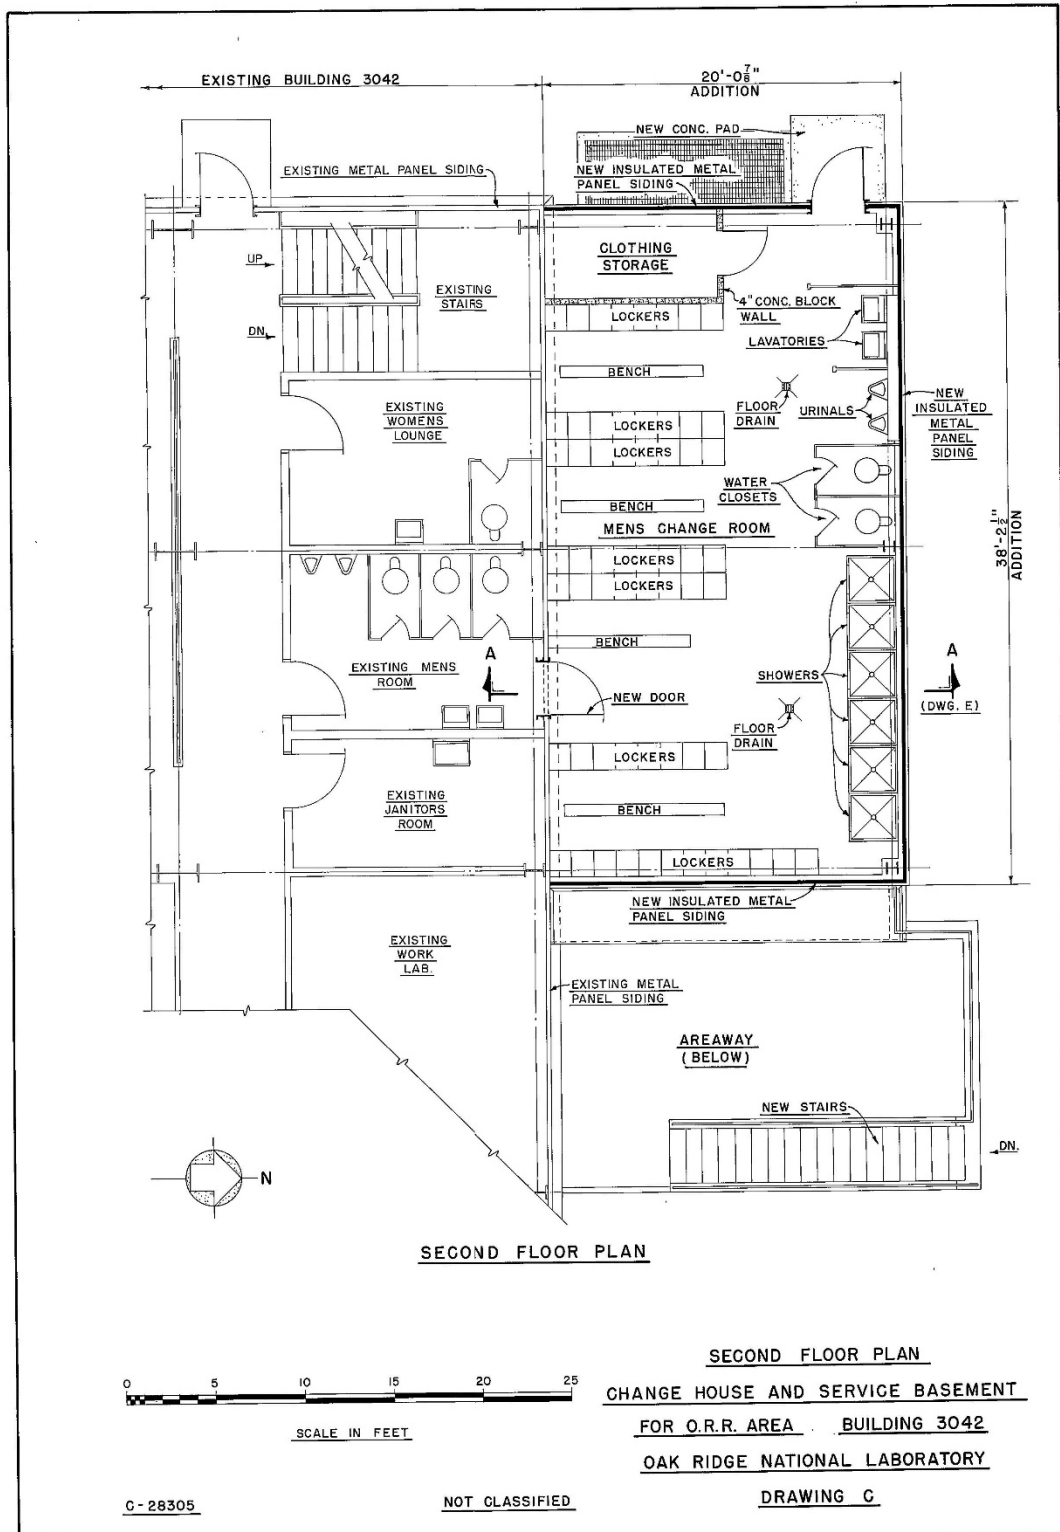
Second floor plan for the circa 1957 Change House and Service Basement addition to the north elevation of Building 3042 (Oak Ridge National Laboratory, n.d.).
